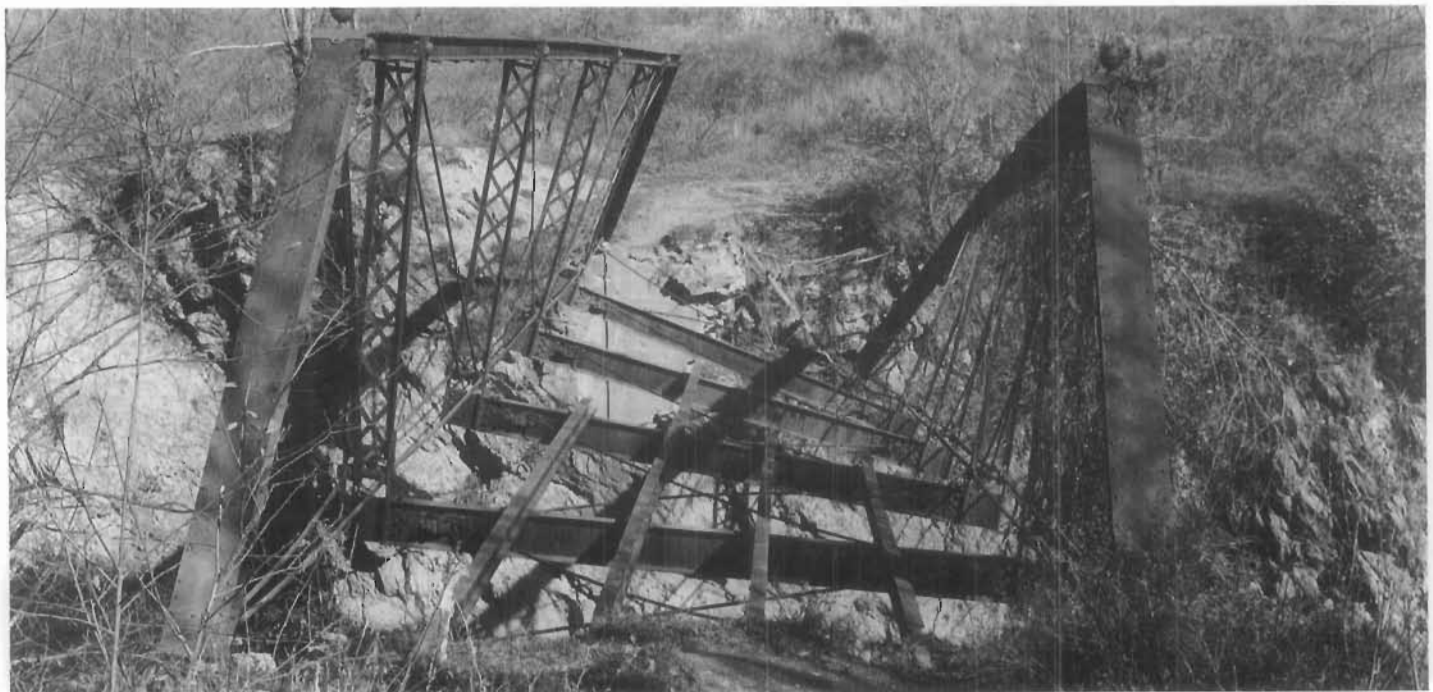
Structural Failure. This 19th-century wrought-iron truss bridge at Brunswick, New York, partially collapsed because the cut-stone abutment supporting it washed away. Once the support was removed, the bridge twisted. (John G. Waite)
